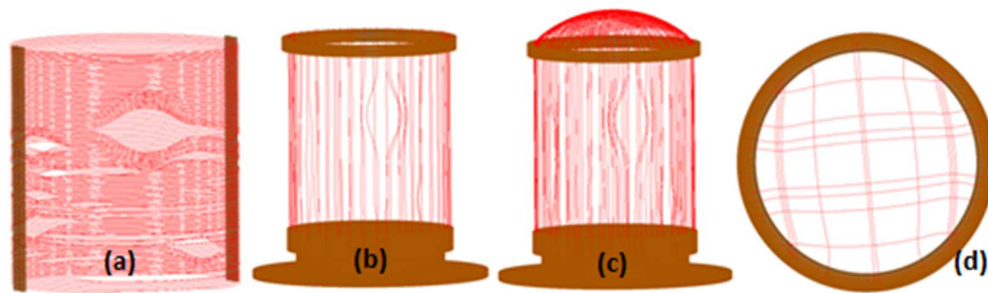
Types of prestressing cables in NCBs (a) Horizontal cables limited to the wall's height (b) Vertical cables limited to the wall's height (c) Gamma cables crossing the wall and the dome (d) Dome cables
